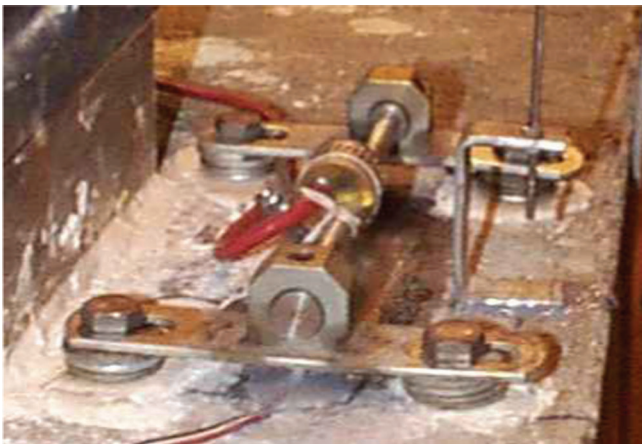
A surface mounted vibrating wire gage positioned over an electrical resistance surface gage.
